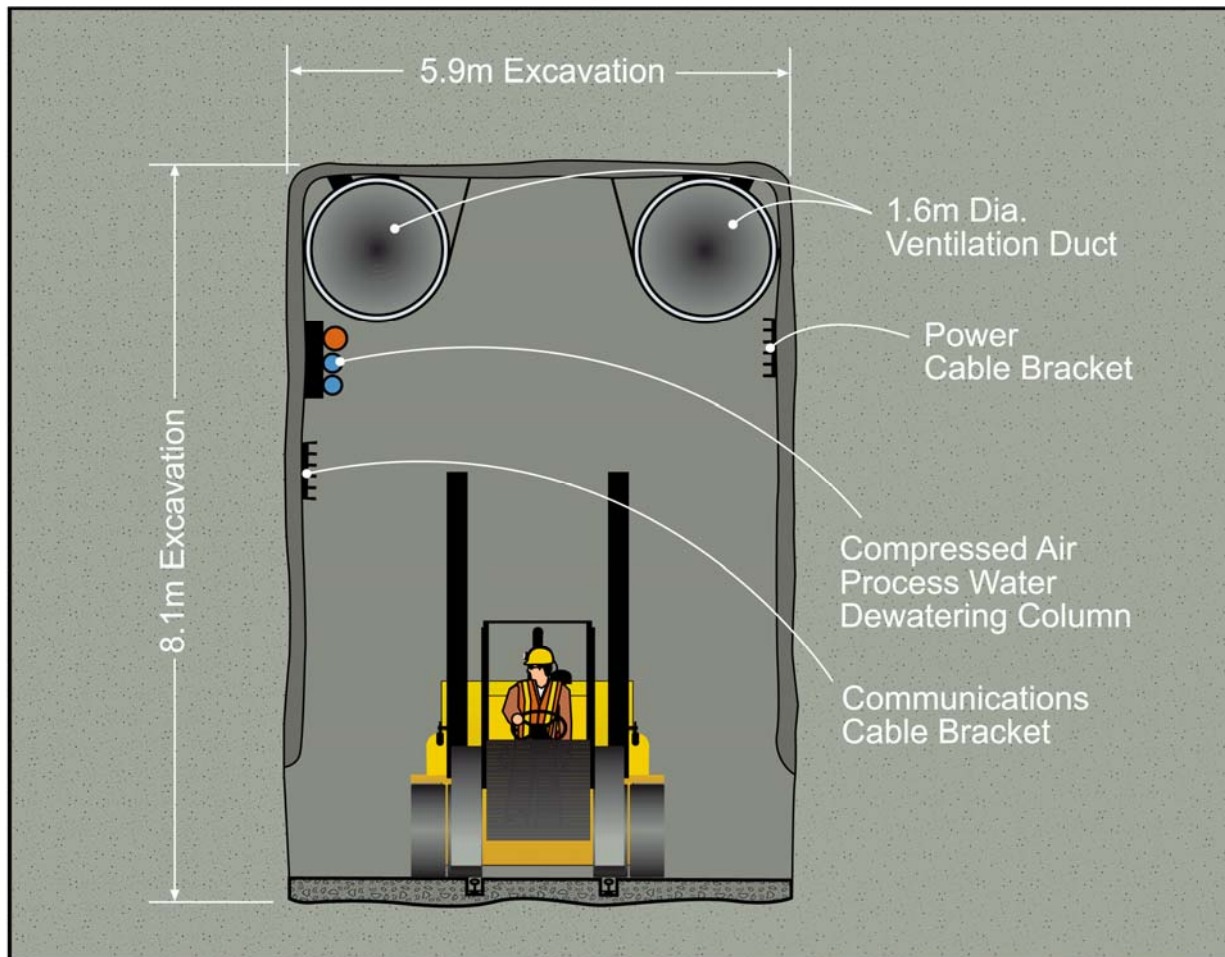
South Access and Panel Access Tunnels Showing Typical Services
